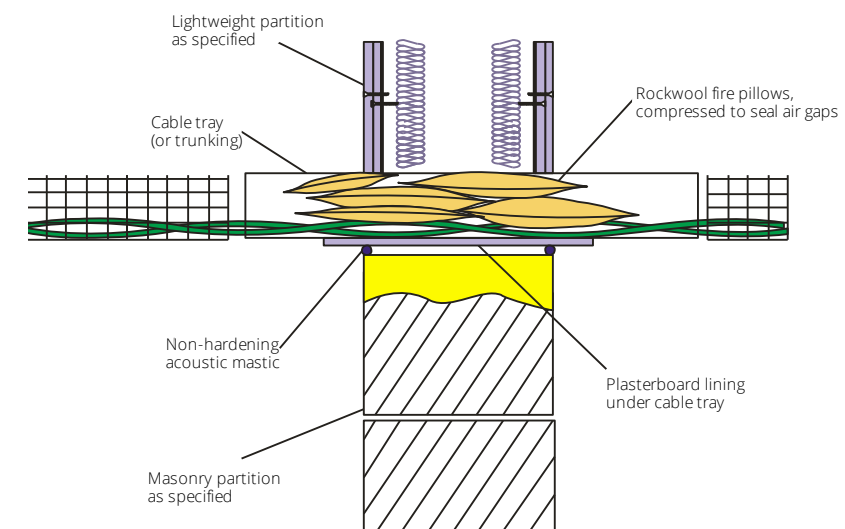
RSD Cable Tray and Trunking Detailing
